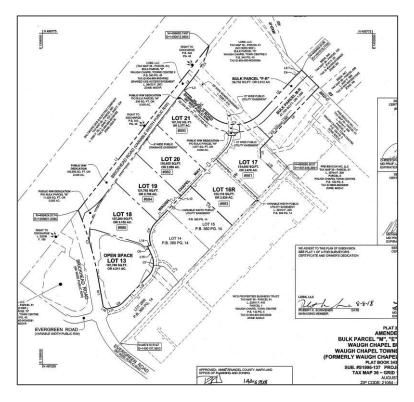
Summerfield Road Connection to Brickhead Road/Evergreen Road (Source: Plat 0361/0037)
